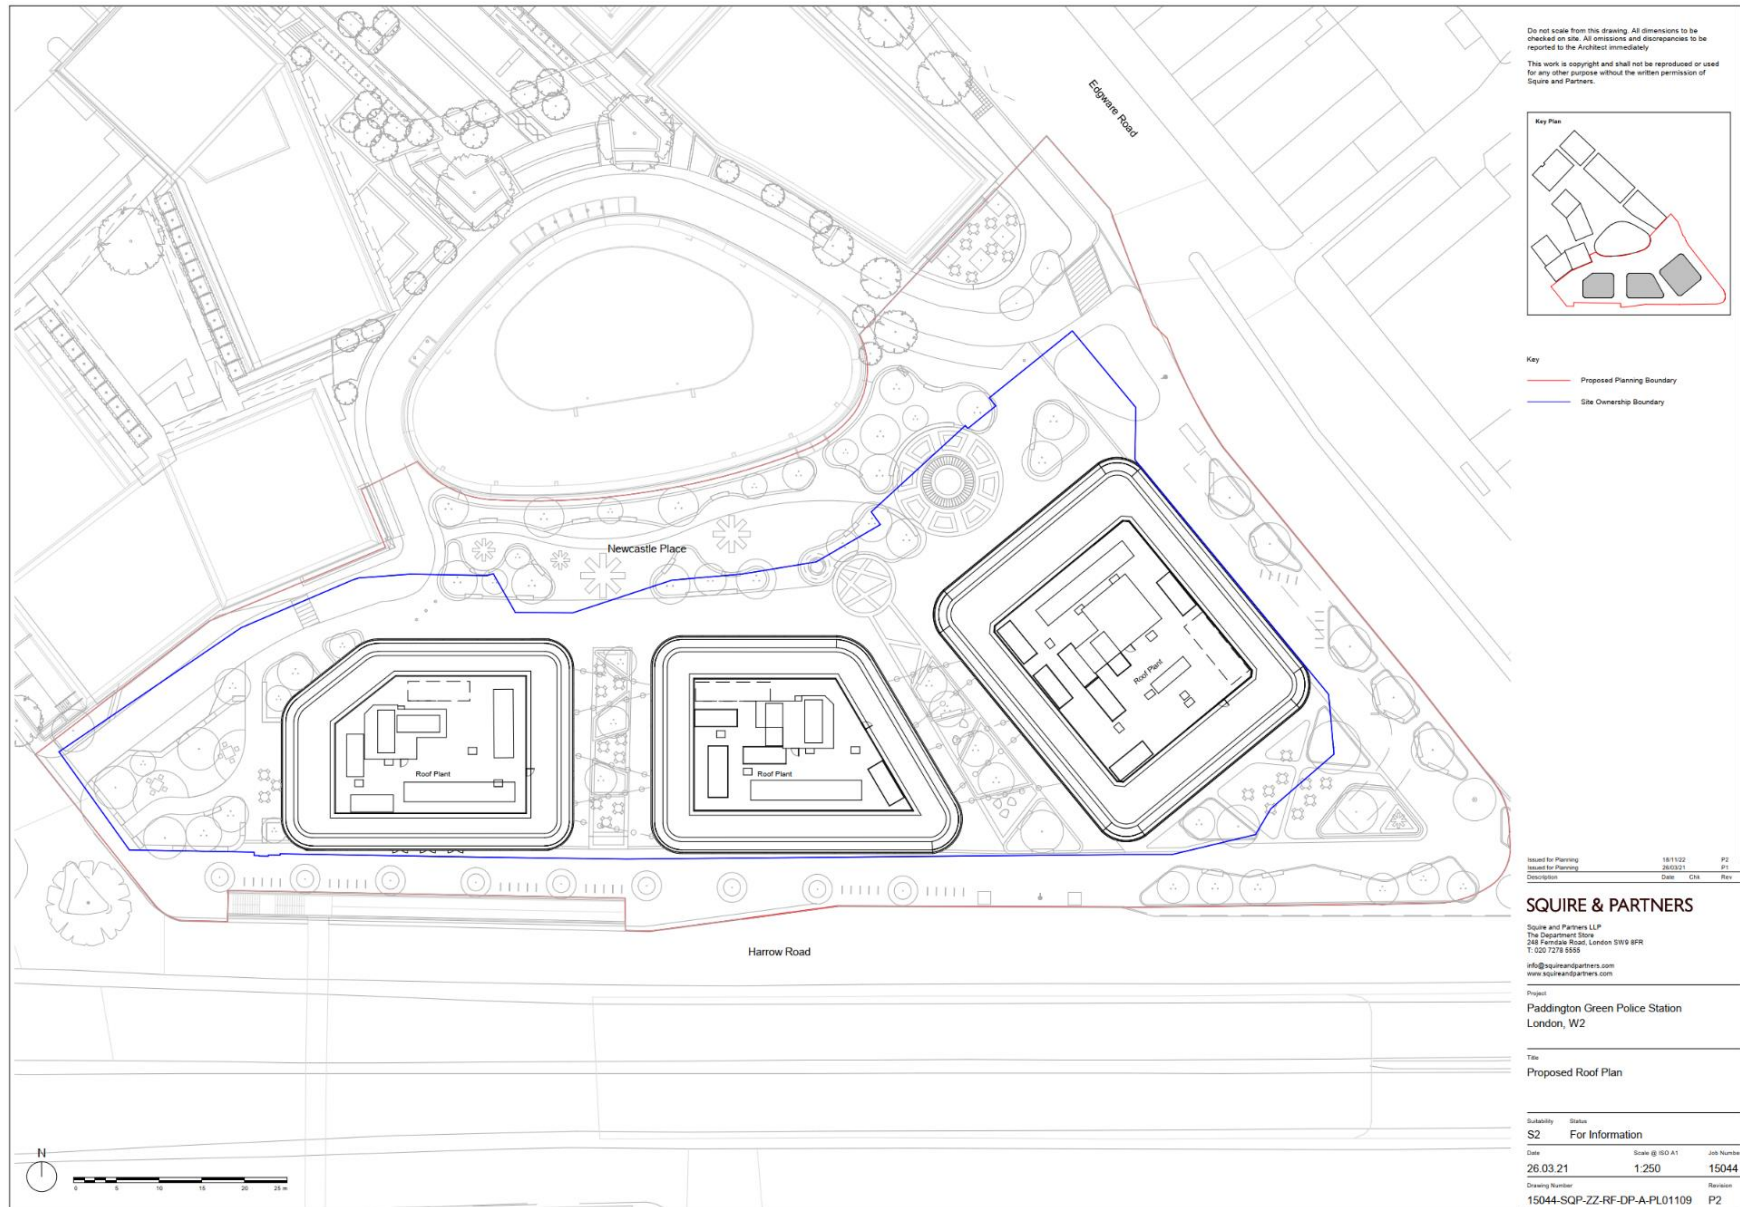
2022 Amended Proposed Development Roof Plan
